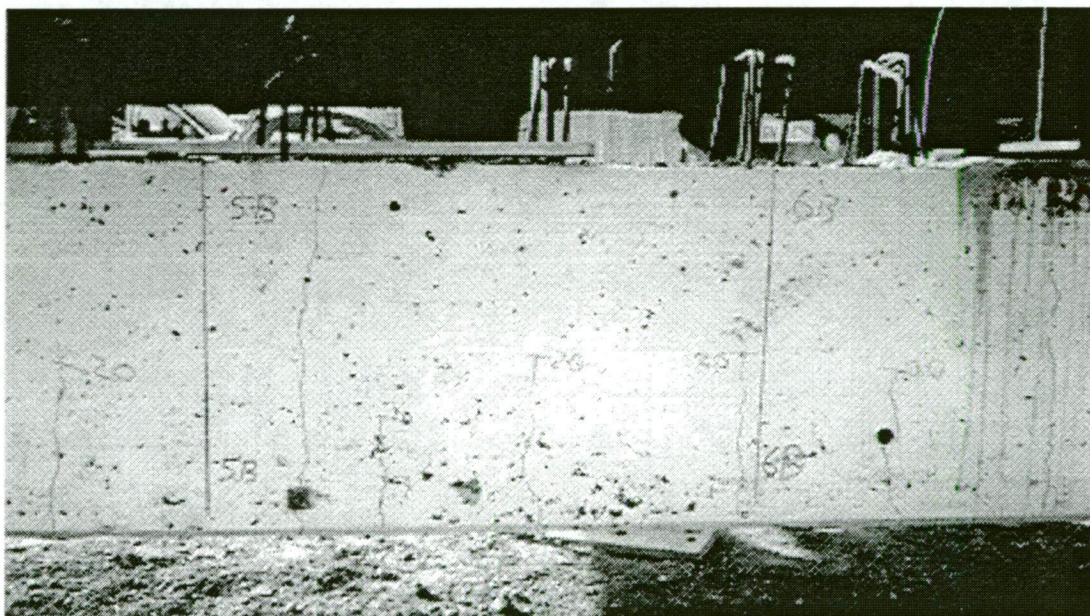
Flexural Beam Crack Patterns
